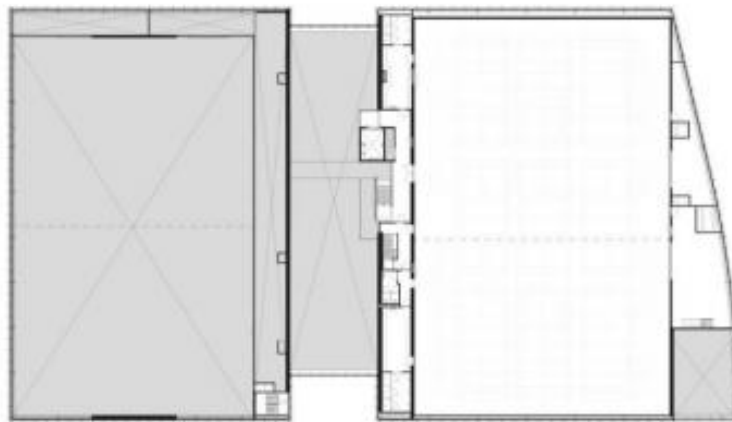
First Floor plan layout of Erasmus University Sport Hall
